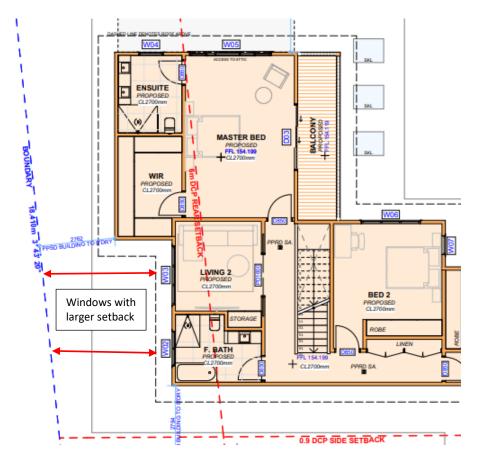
The proposed location of high-set windows W02 and W03 on western elevation
